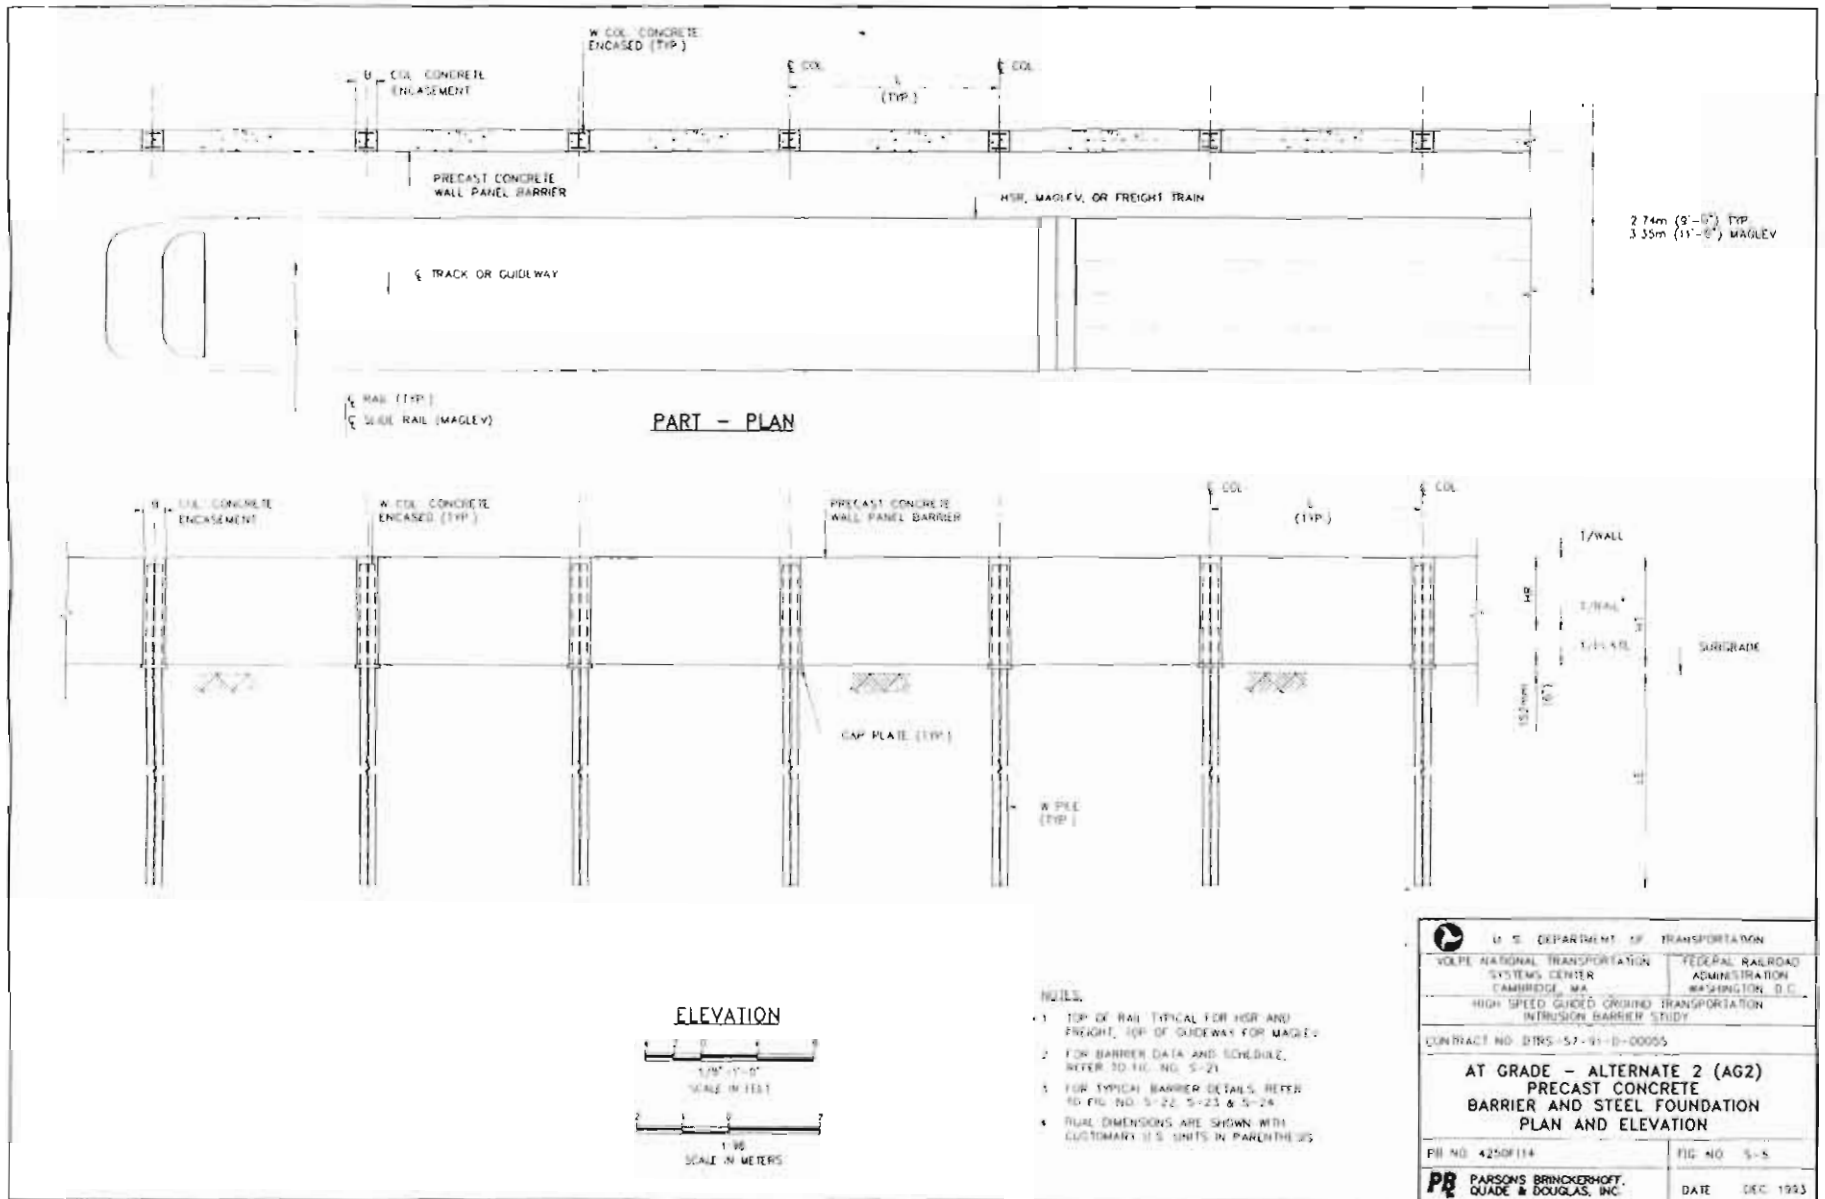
AT GRADE ALTERNATE 2: P/C WALL AND STEEL FOUNDATION - PLAN AND ELEVATION
